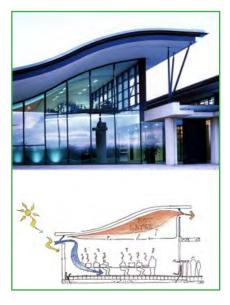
An example of a building that has been designed to maximise cross flow ventilation.
